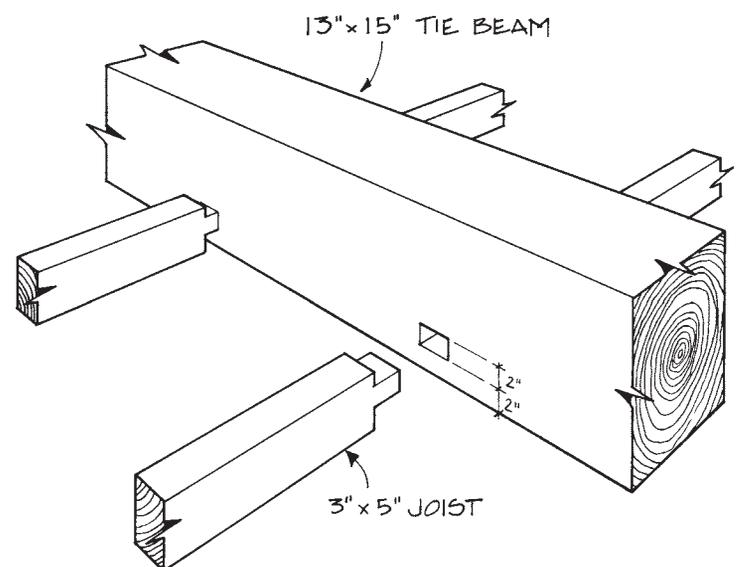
Beech ceiling joists with shortened shoulders are secured from movement by a single cut nail in the Second Congregational Church, Newport, New Hampshire (1823).
